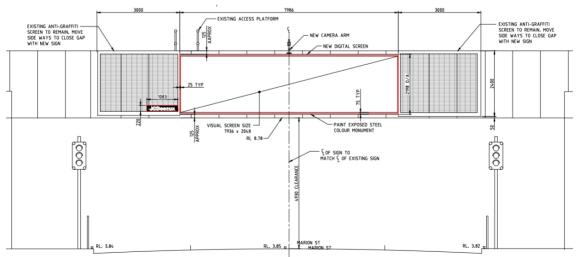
Digital signage plan (Source: Dennis Bunt Consulting Engineers)
